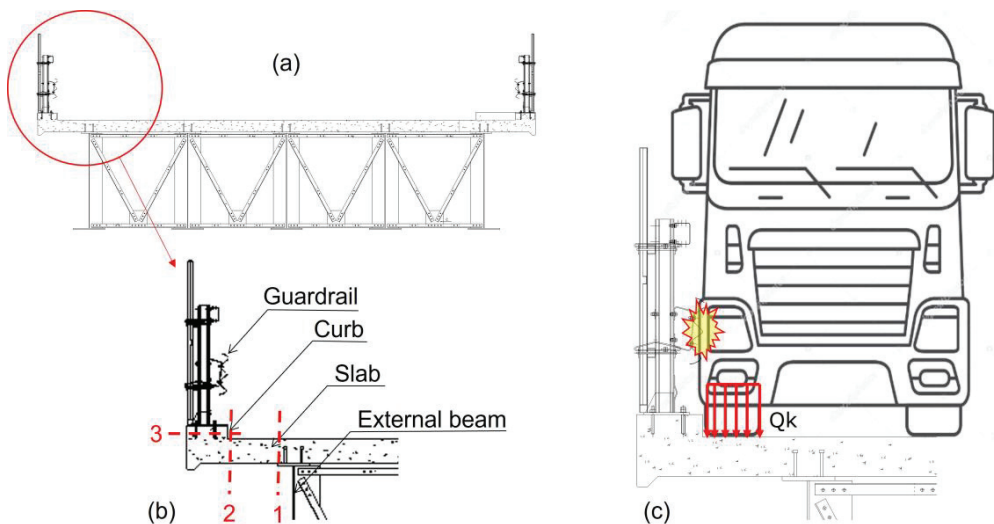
(a) Bridge deck section with reinforced concrete slab, (b) guardrail supporting elements and critical sections, and (c) truck impact position.
